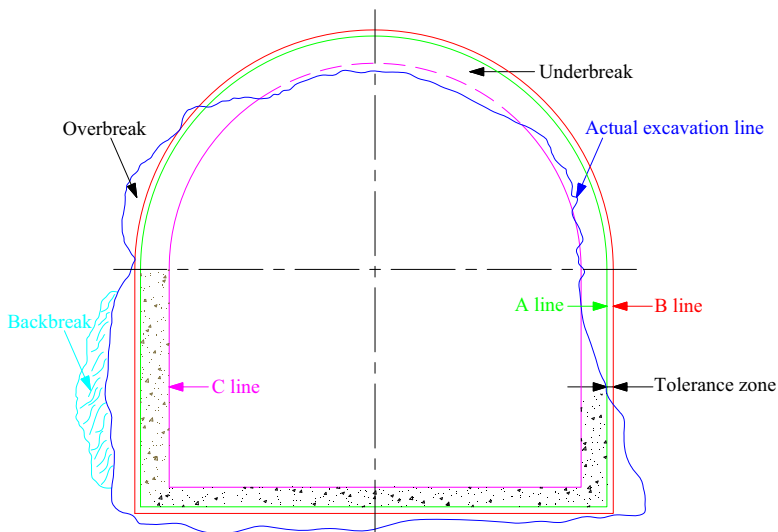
A roadway cross-section with design lines and typical zones of underbreak and overbreak (Maerz et al., 1996)
